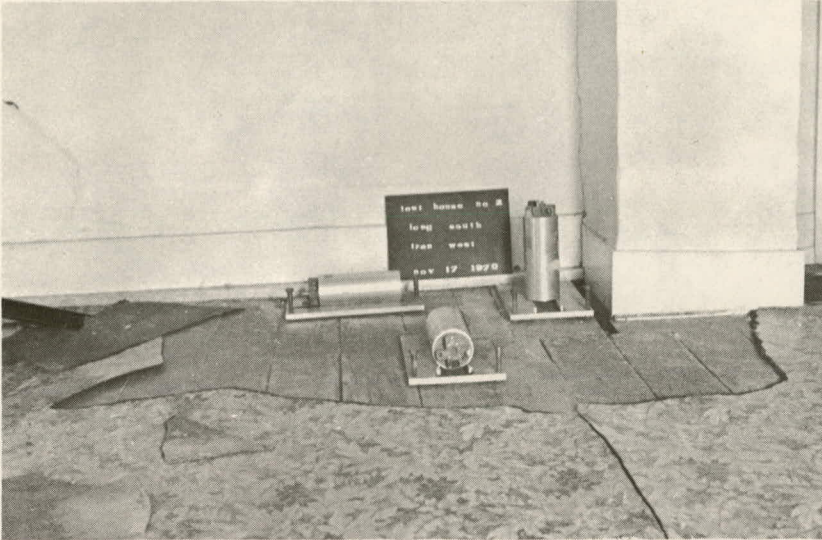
Station #2, Test House #2, Nov. 17, 1970. Seismometers located second floor, center of building.
